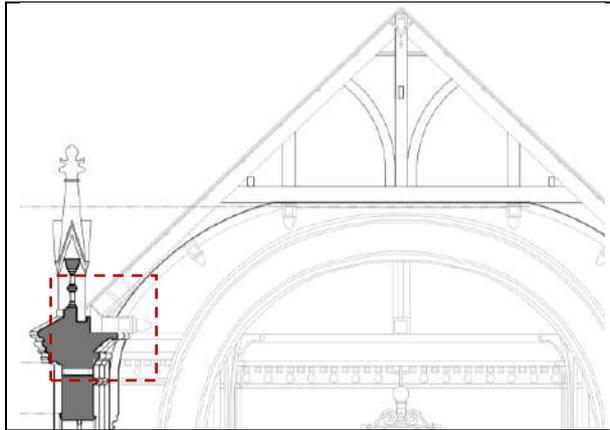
Section detail of the rafter resting on the brick masonry wall, showing cross-section cut for gutter widening.
